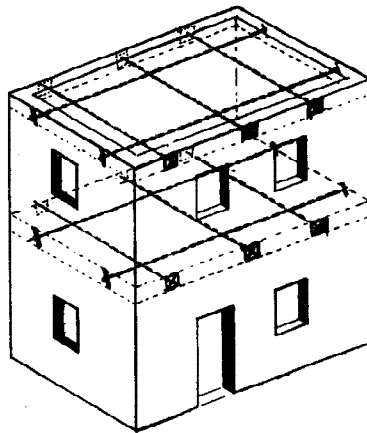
Tendons inside timber floors, connected to external walls by various type of anchorages.
